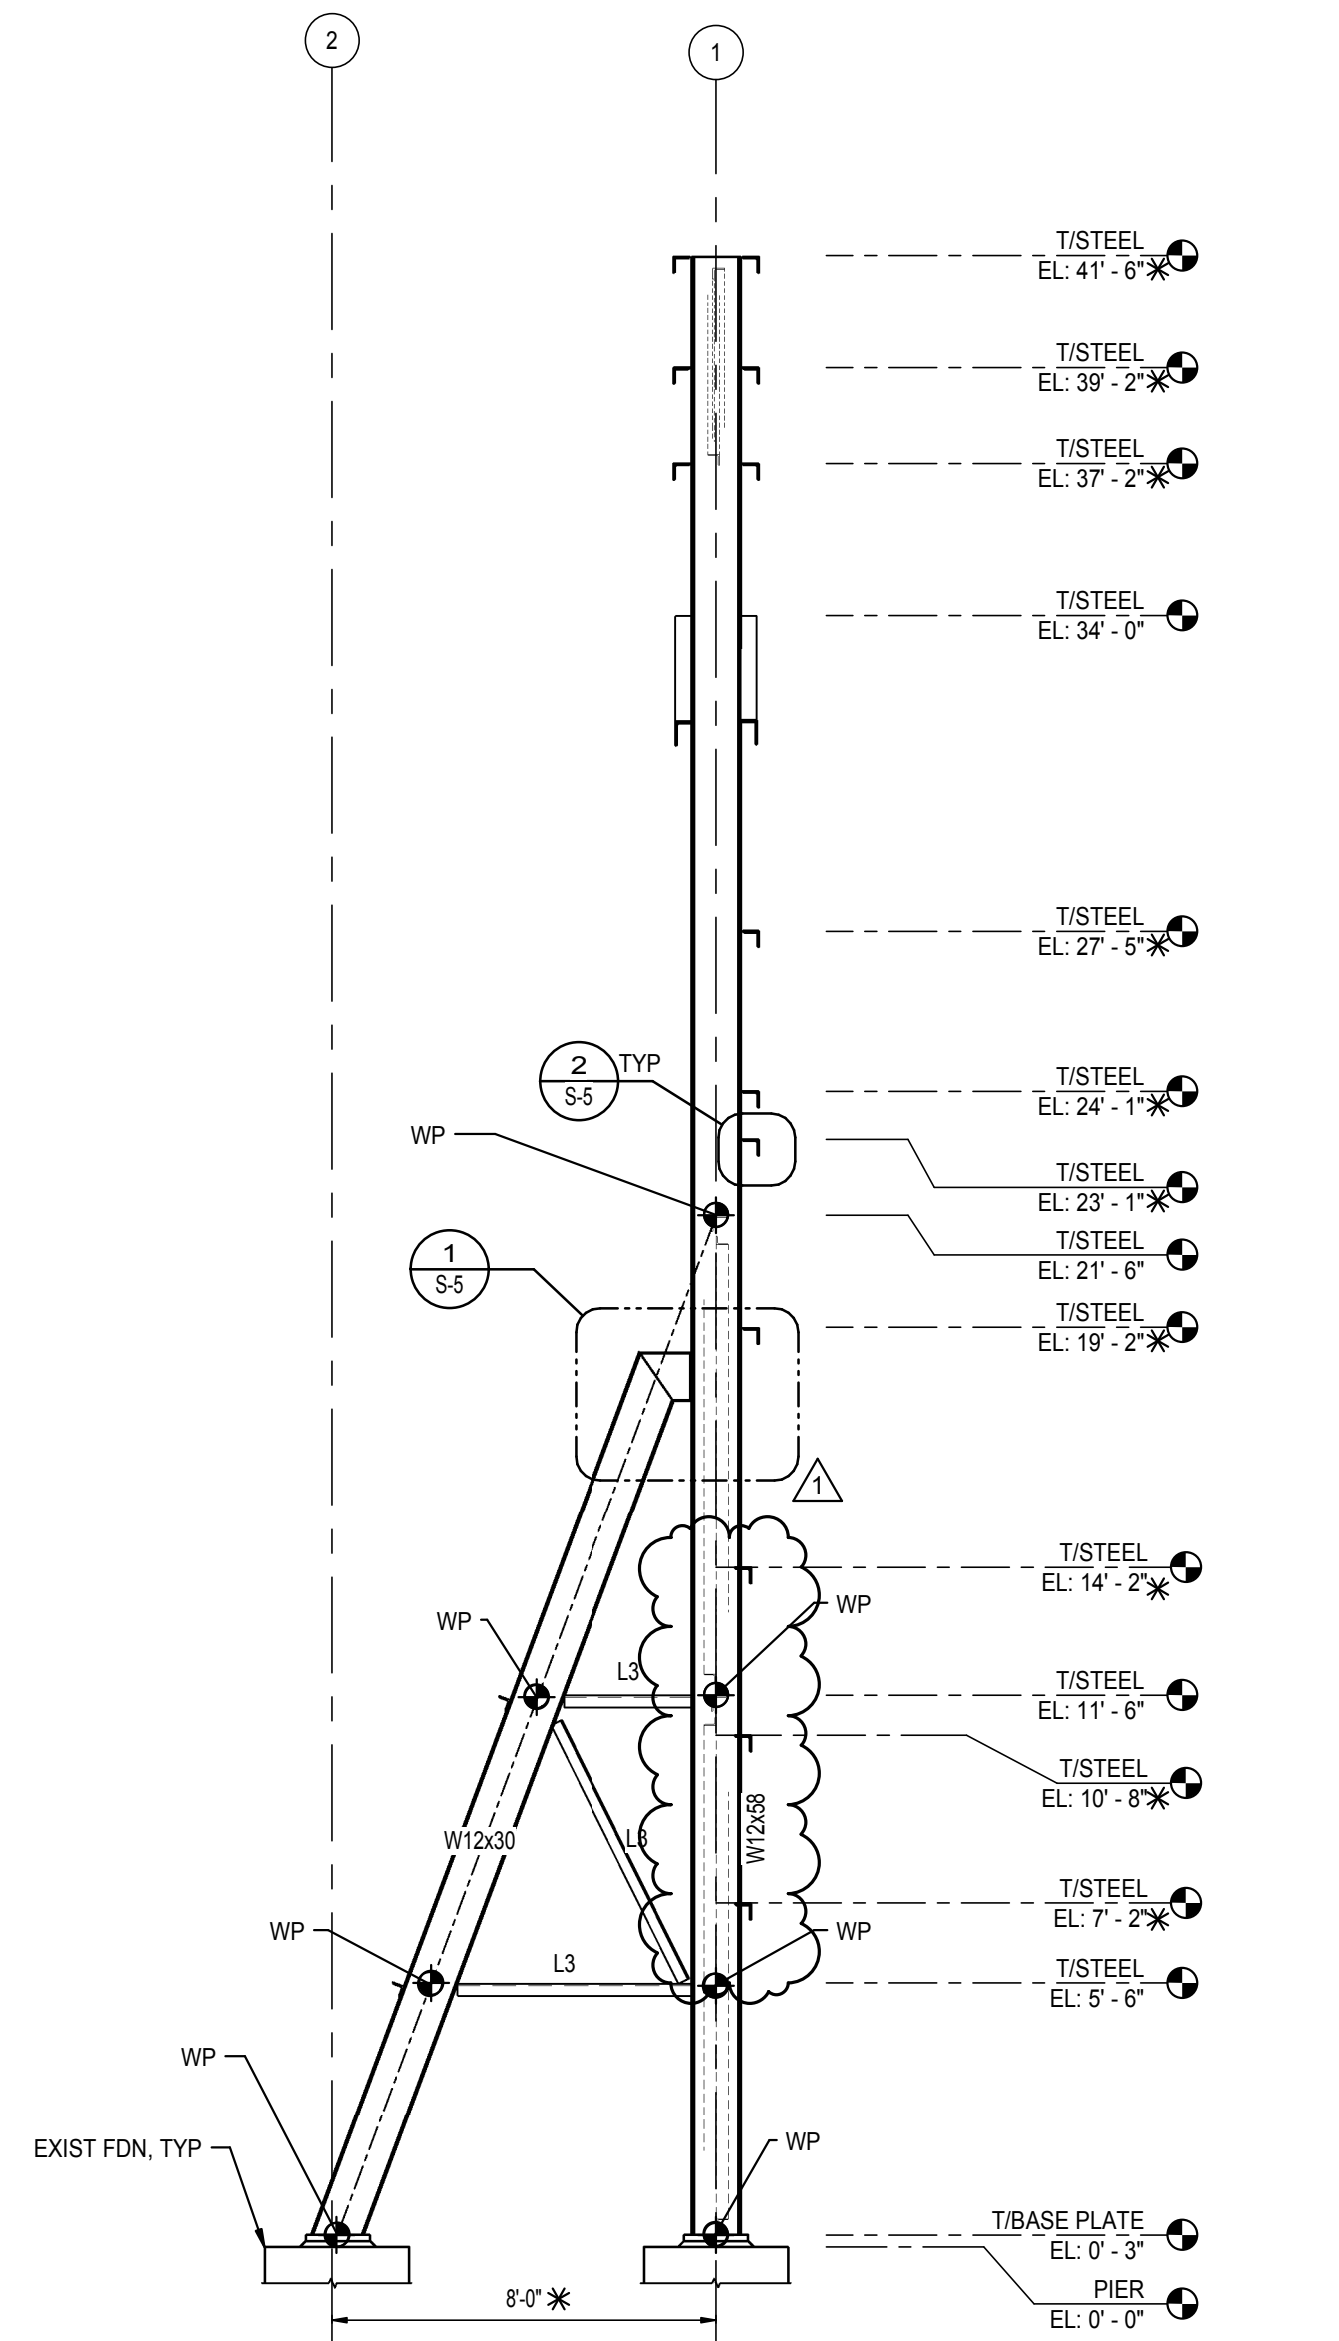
FRAMING ELEVATIONS, COLUMN LAYOUT, AND BASE PLATE DETAIL
